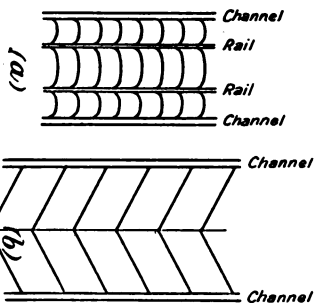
Showing Plan of Concrete Floor of Stables; (a) with Rails and Curved Cross Channels; (b) with Straight Channels.
